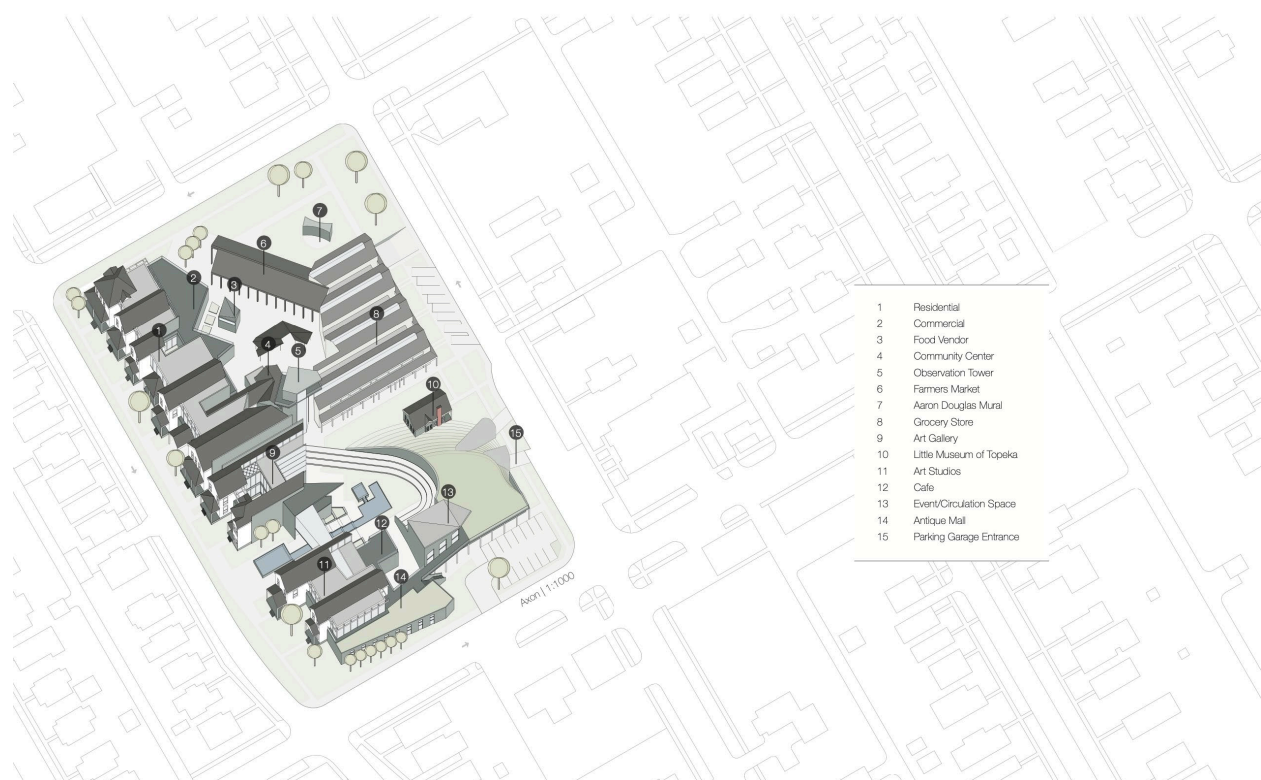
Axon site plan of "Preserving Open Spaces" (Student project by Jacob Albrecht and Sierra Dubois, 2016)
